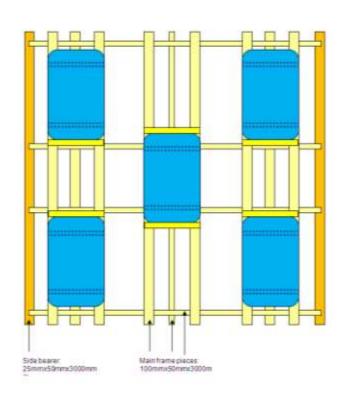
Constructing and launching the tern raft at RSPB Otmoor
